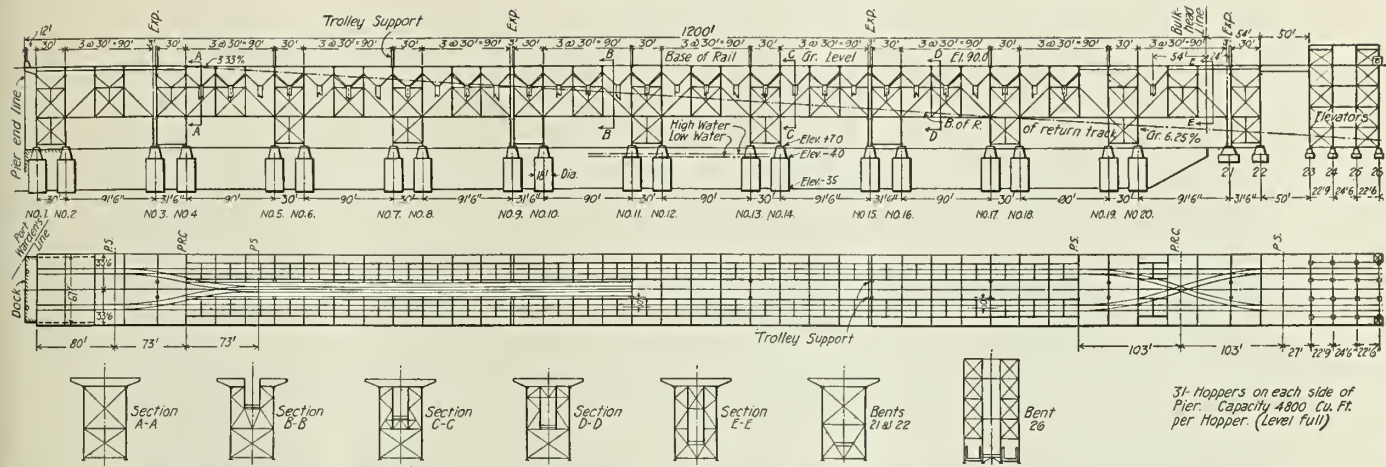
General Plan and Elevation of New Coal Pier No. 4, Norfolk & Western Ry., Lamberts Point Terminal.
